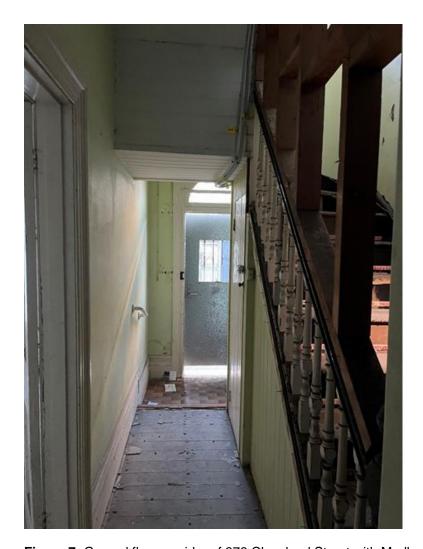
Ground floor corridor of 378 Cleveland Street with Marlborough Street in the background
